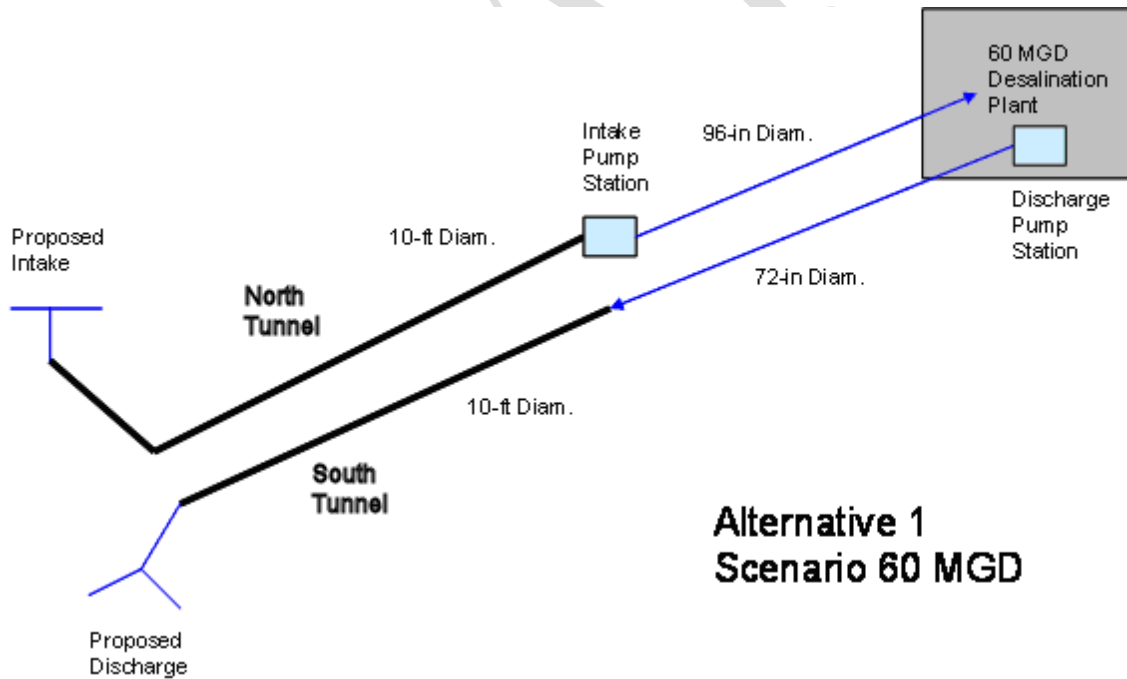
AES Redondo existing intake/discharge Alternative 1, 60 MGD layout.
